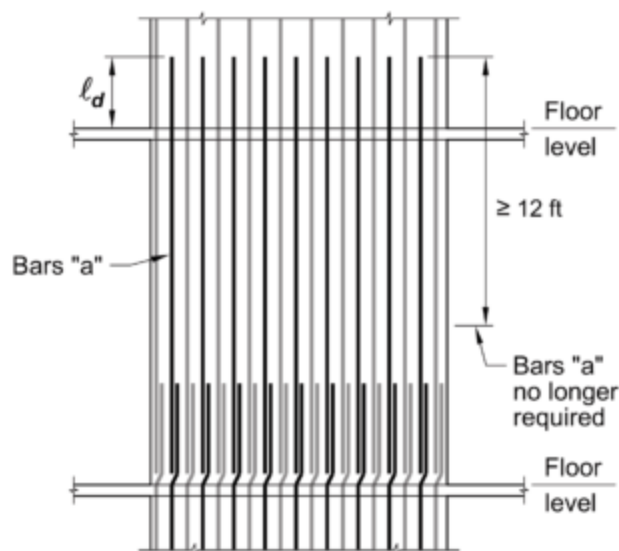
Termination of longitudinal wall reinforcement.
